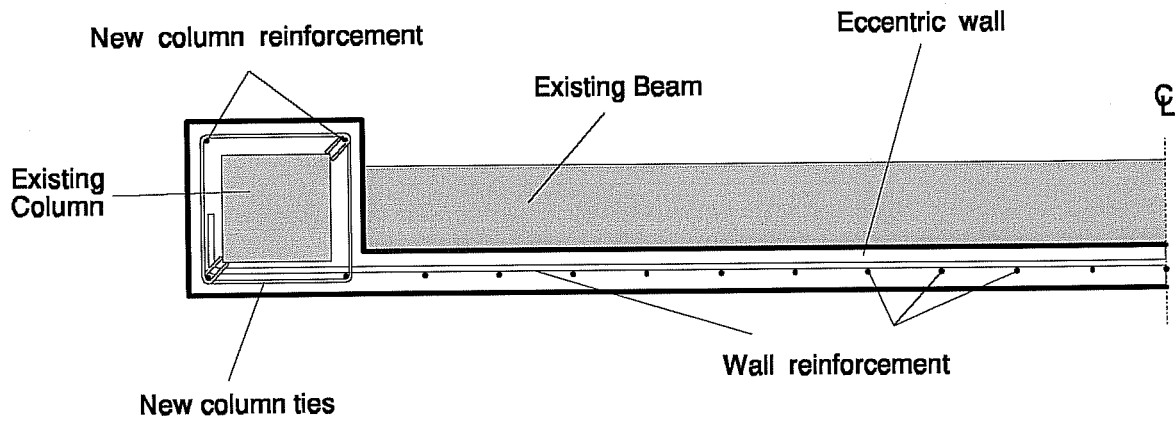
Strengthening of an existing building frame with an eccentric wall and reinforced concrete jacket of columns.
